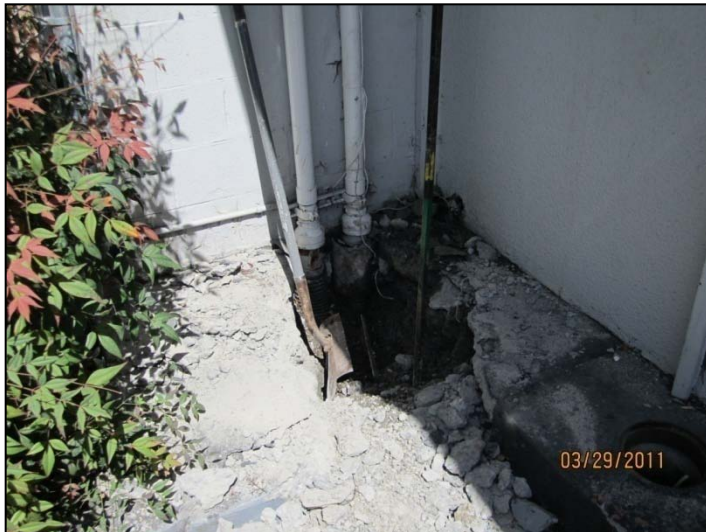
UST vent pipes day-lighting at northwest corner of station building. Vent pipes are double contained at the 90-degree transition from below grade to above grade.
